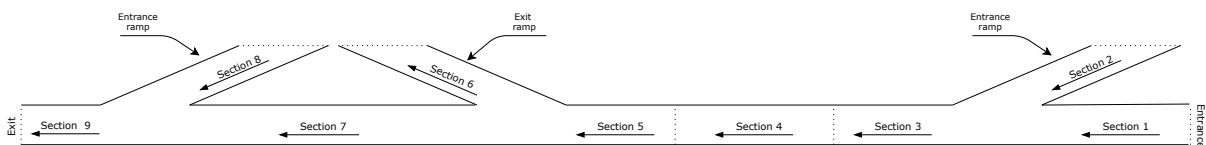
A schematic representation of a road tunnel complex containing ramps. The tunnel is divided into several sections with the constant geometry.
